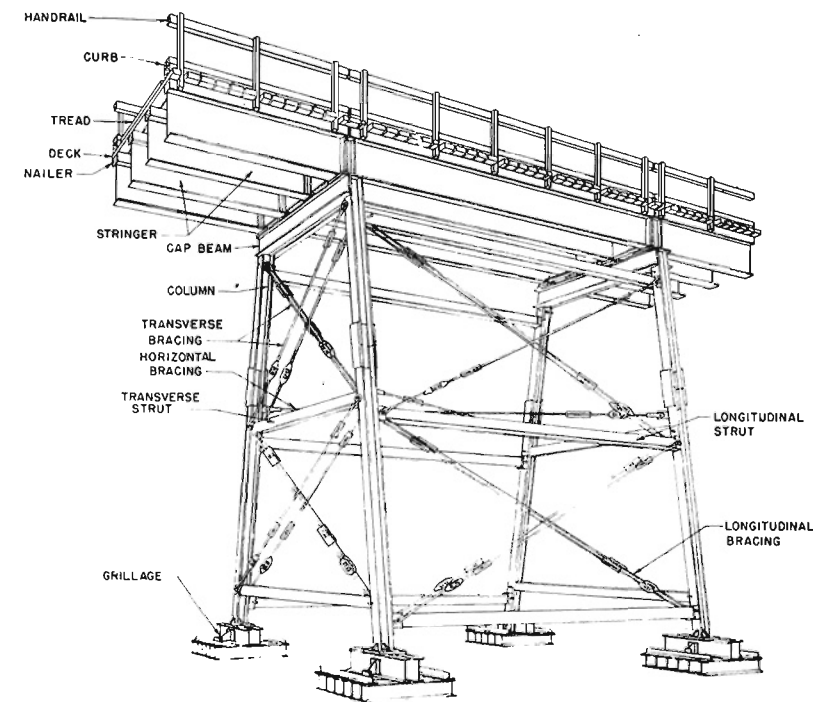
Highway bridge, class 50, single-lane, steel stringer spans, steel tower on steel grillages.
